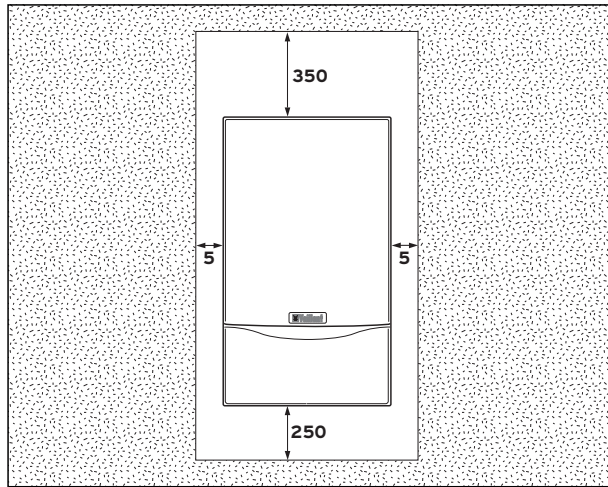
Required minimum gaps/assembly clearances (mm)
